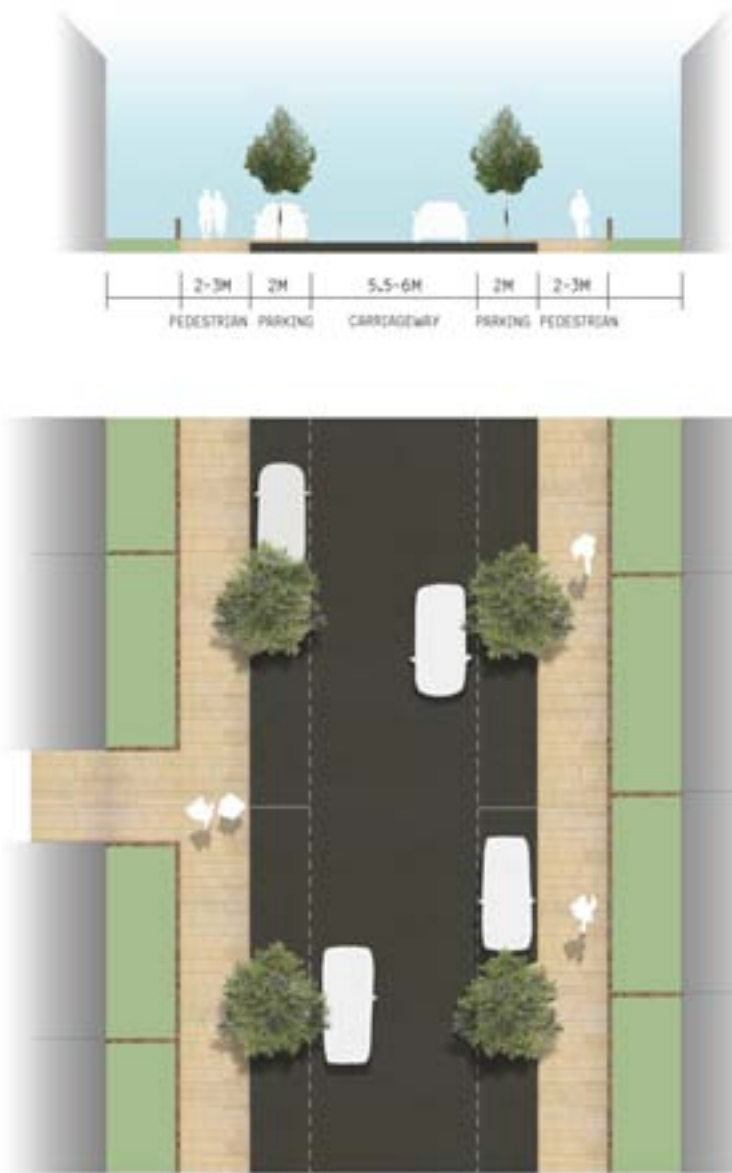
TYPICAL SECONDARY STREET CROSS SECTION
